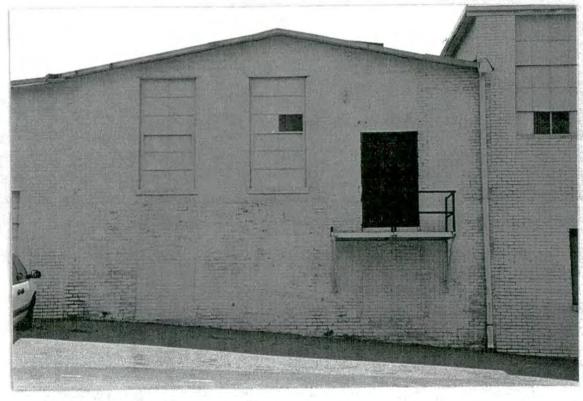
Hickory Hosiery Mill – southwestfacing 7th Avenue NE façade of central 1910s building
